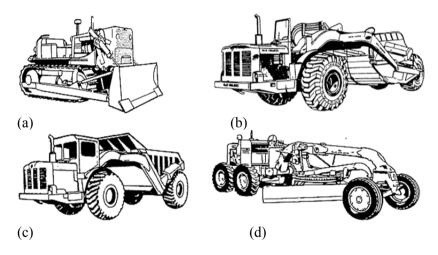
Road-making machines. (a) Bulldozer. (b) Motor scraper. (c) Heavy-framed truck. (d) Motor grader
